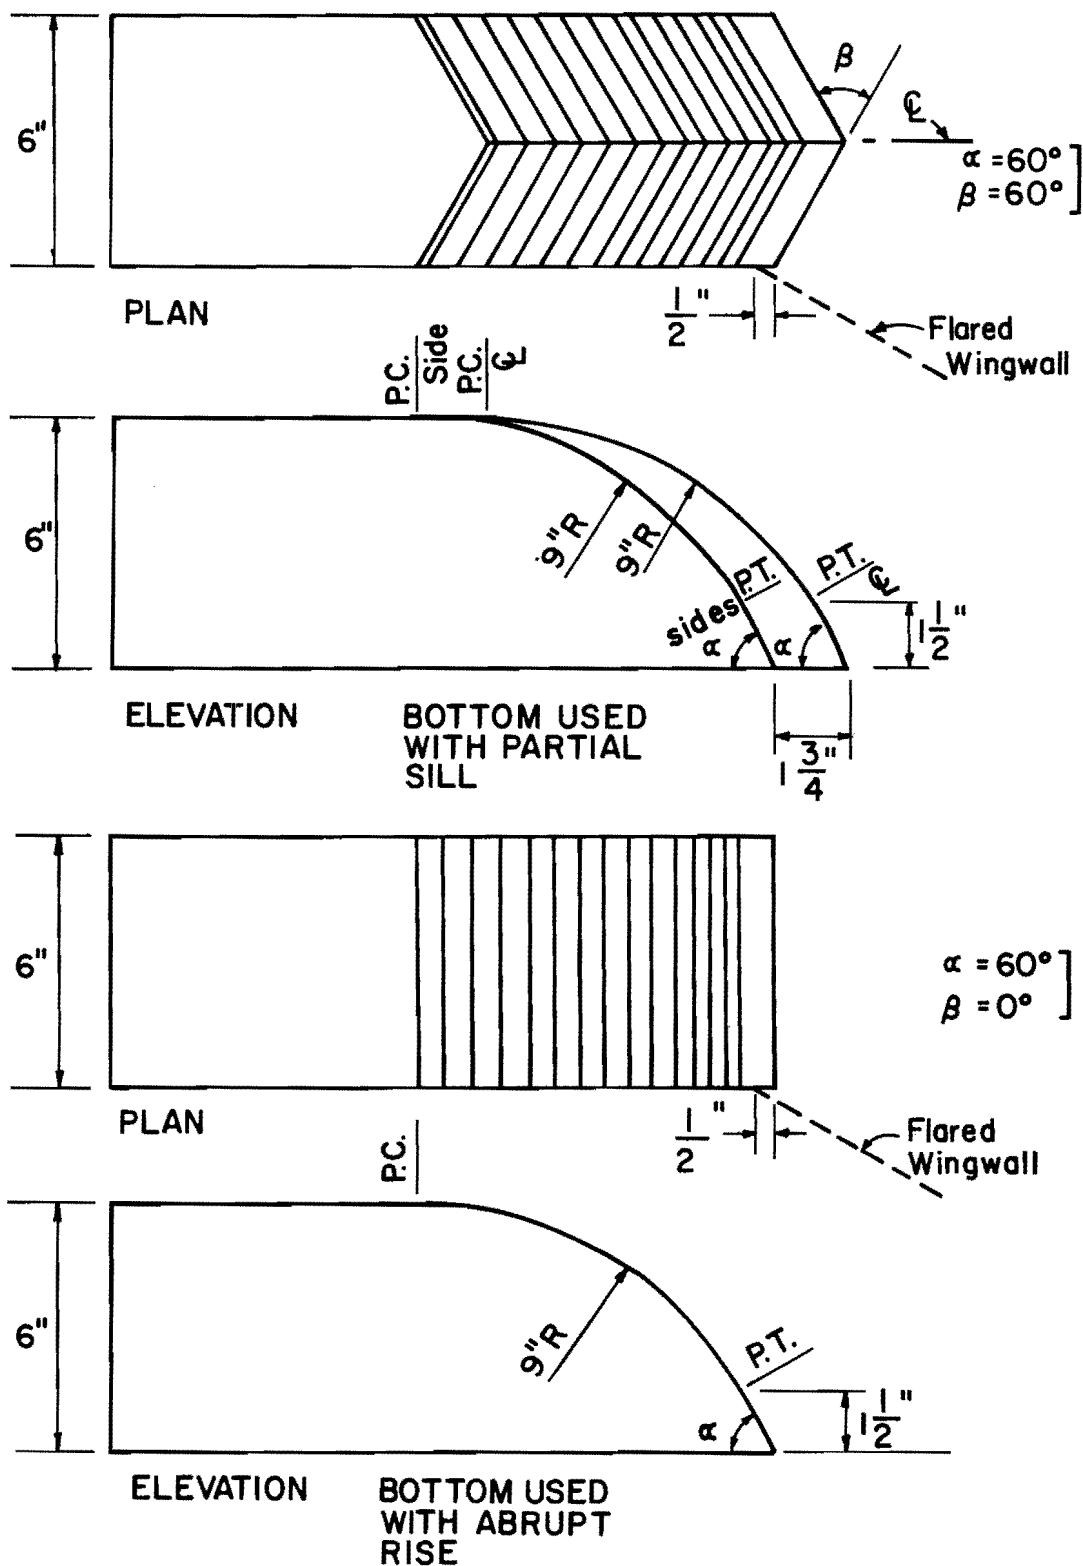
DETAILS OF REMOVABLE ENTRANCE CHANNEL BOTTOMS
